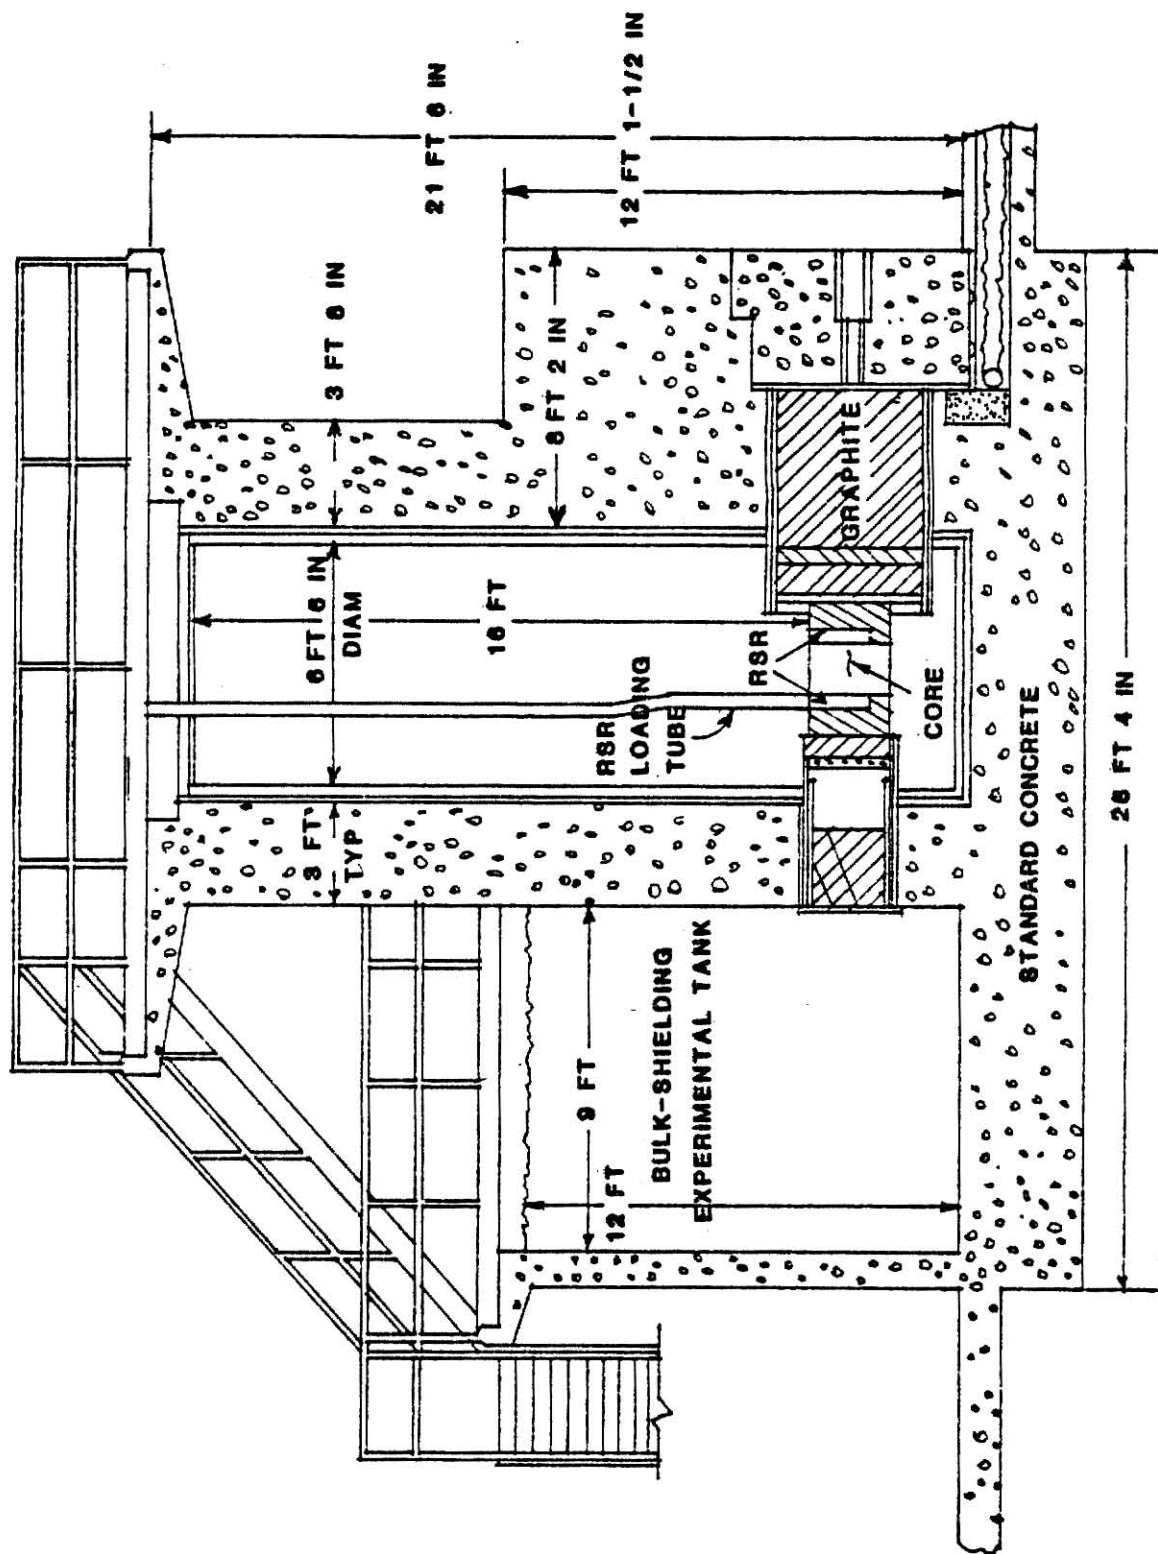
Location of Rotary Specimen Rack Loading Tube in Reactor
